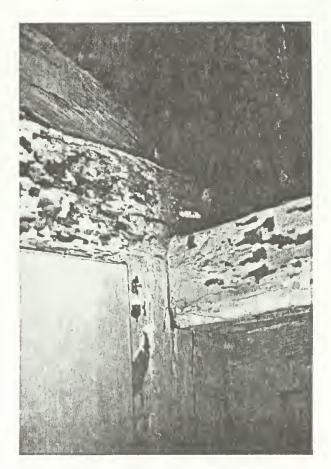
West India Goods Store, interior of second story, west wall looking south, showing pegged post-plate-trussed rafter connection between bays C and D.
